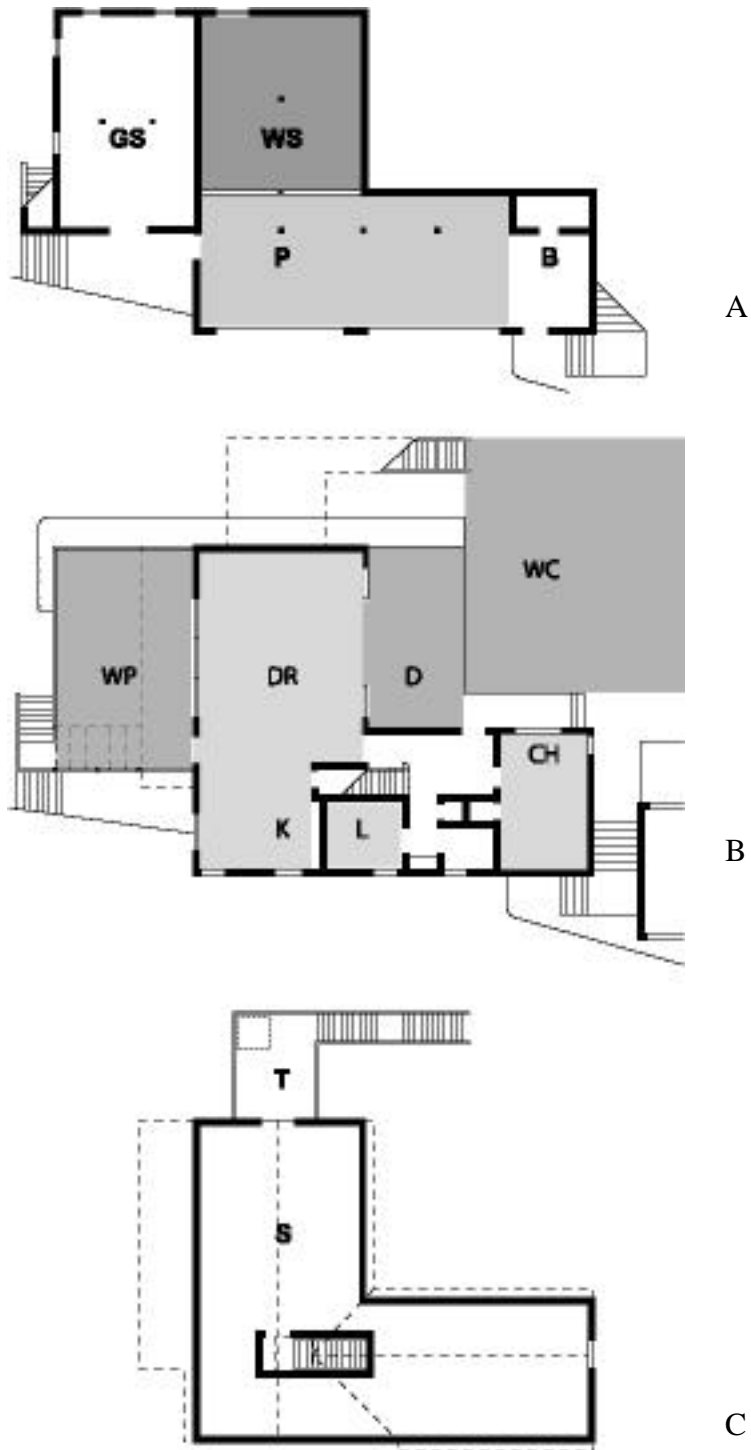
Common house plans (after Preston & Associates, 1997). A) basement, showing the garden storage (GS), wood shop (WS), parking (P) and bicycle storage (B). B) ground floor and its connections to the west porch (WP) and west courtyard (WC) through the deck (D). Main social spaces are marked DR (dining room), K (kitchen), L (laundry) and CH (children's room). C) attic, showing the storage space (S) and the terrace (T).
